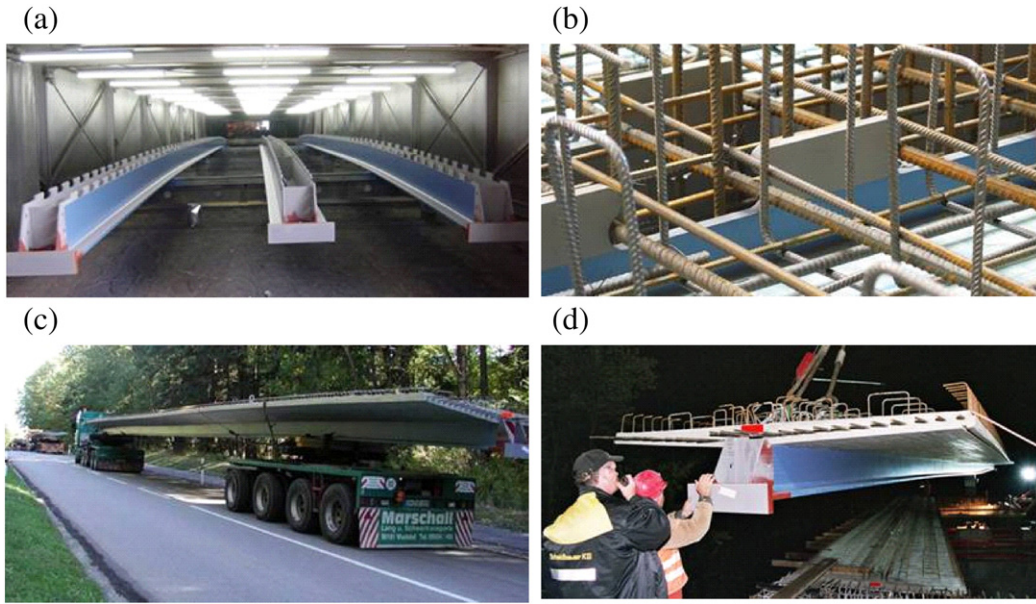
Girders for viaduct in Pöcking (Germany) with puzzle-shaped dowels [13]: a) steel sections, b) steel dowels with reinforcing bars, c) transportation of girders, and d) montage of girders at construction site.
